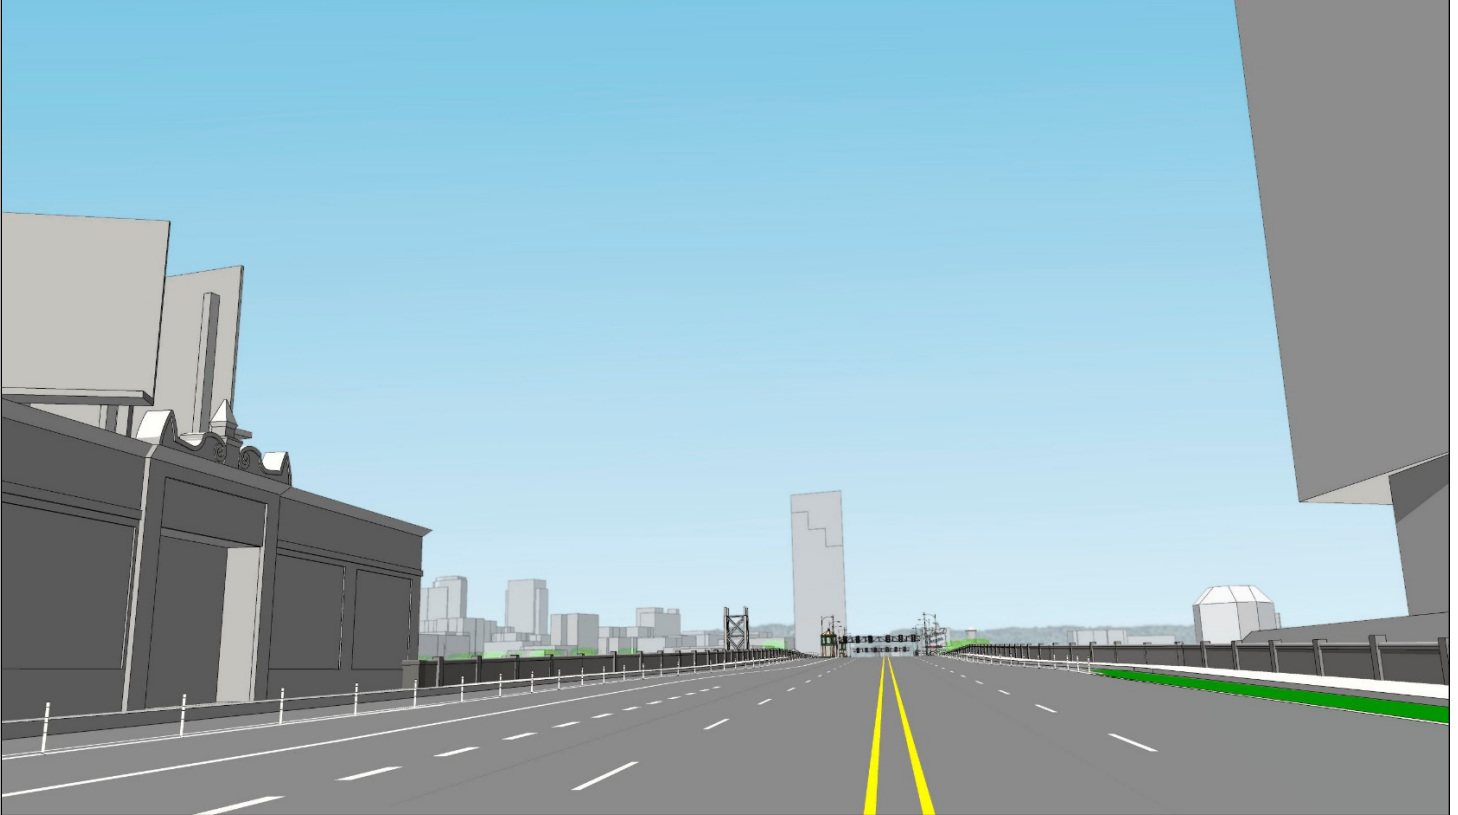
Frigidaire Building, artist's rendering of existing conditions (Fat Pencil Studio, 2021), view looking west.
